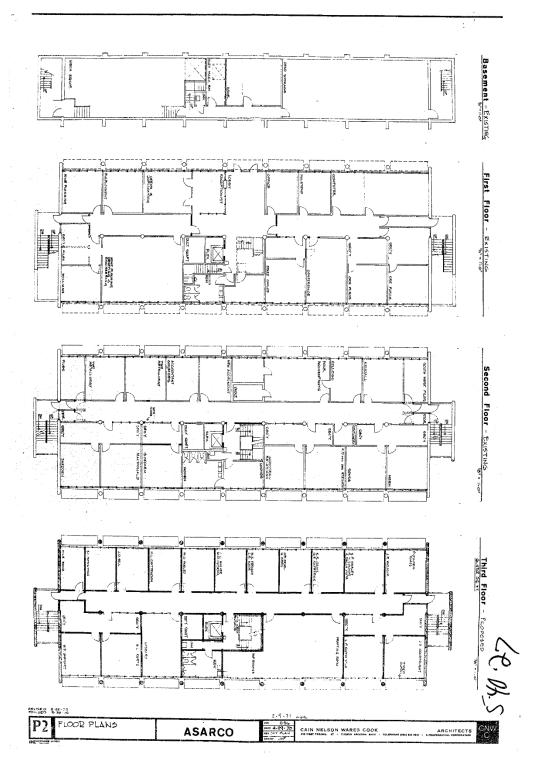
Third story buildout ASARCO Headquarters floor plans. Note that these plans are not as built and the stairway never extended to the third story. April 1970. (CNWC. Courtesy of the Fenton Investment Company, Inc.)
